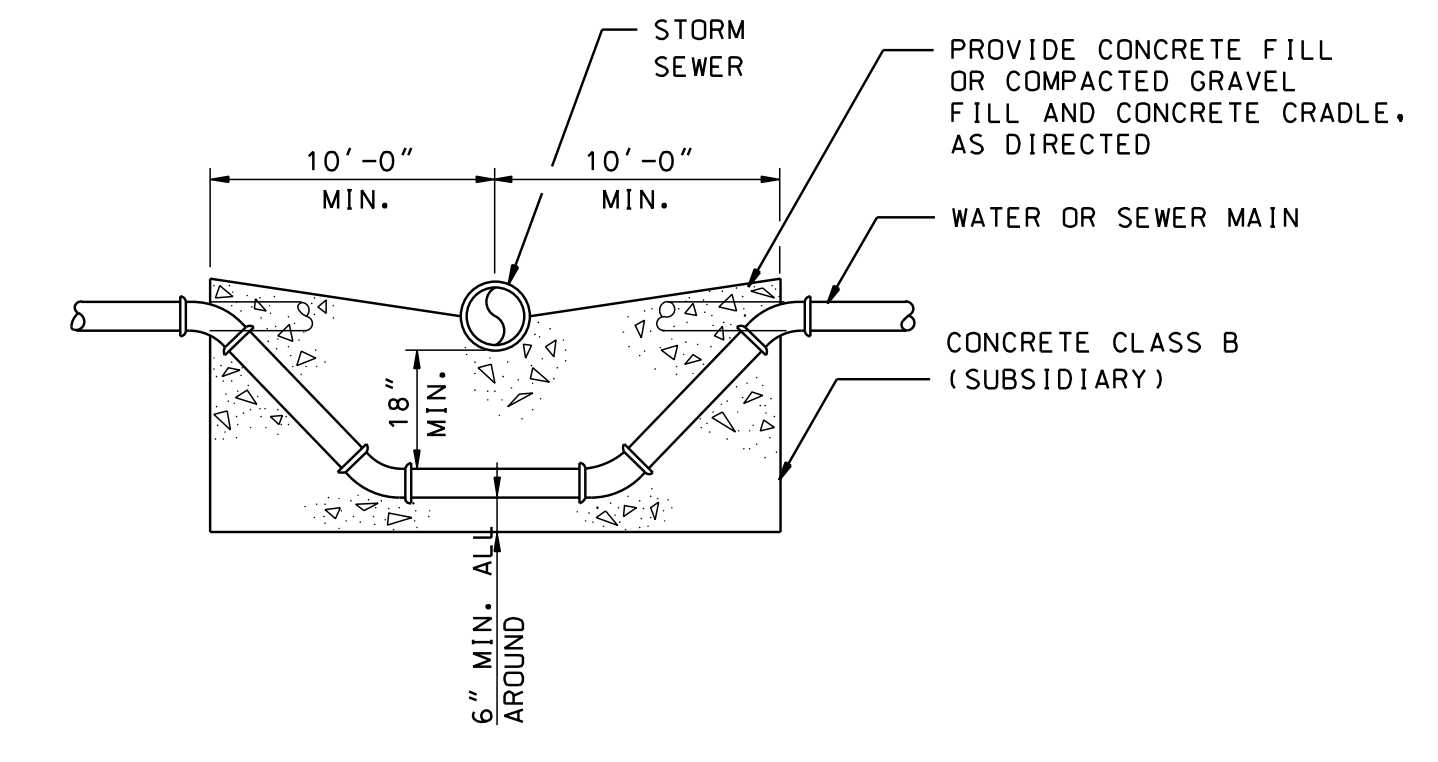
WATER/SEWER MAIN RELOCATION - ABOVE STORM SEWER
